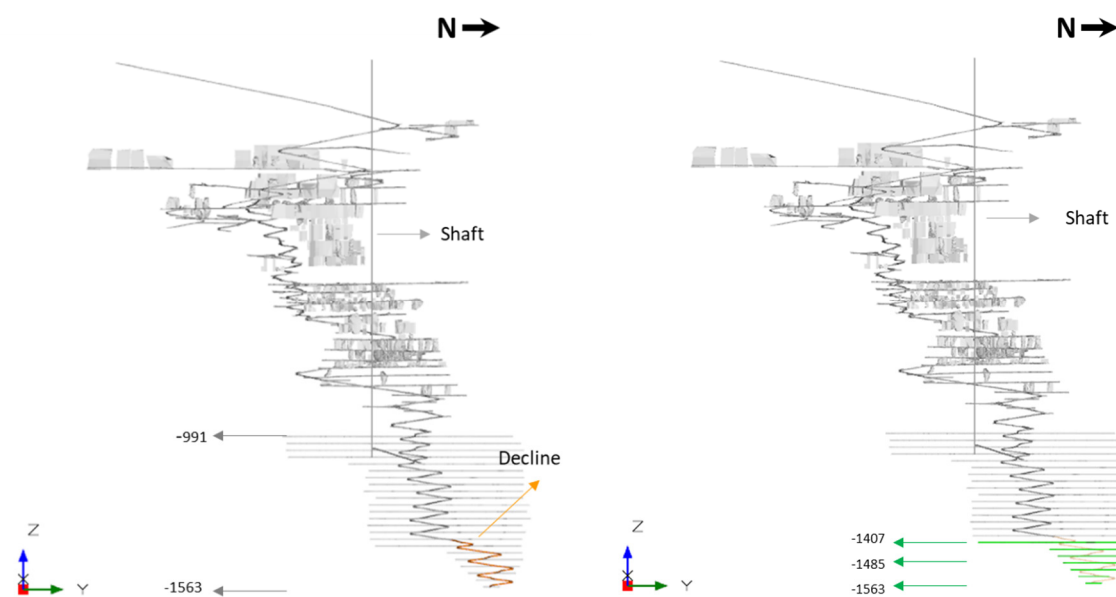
General Layout of Pilar UG Development, Deepening Extension Zone (MCSA, 2020)
